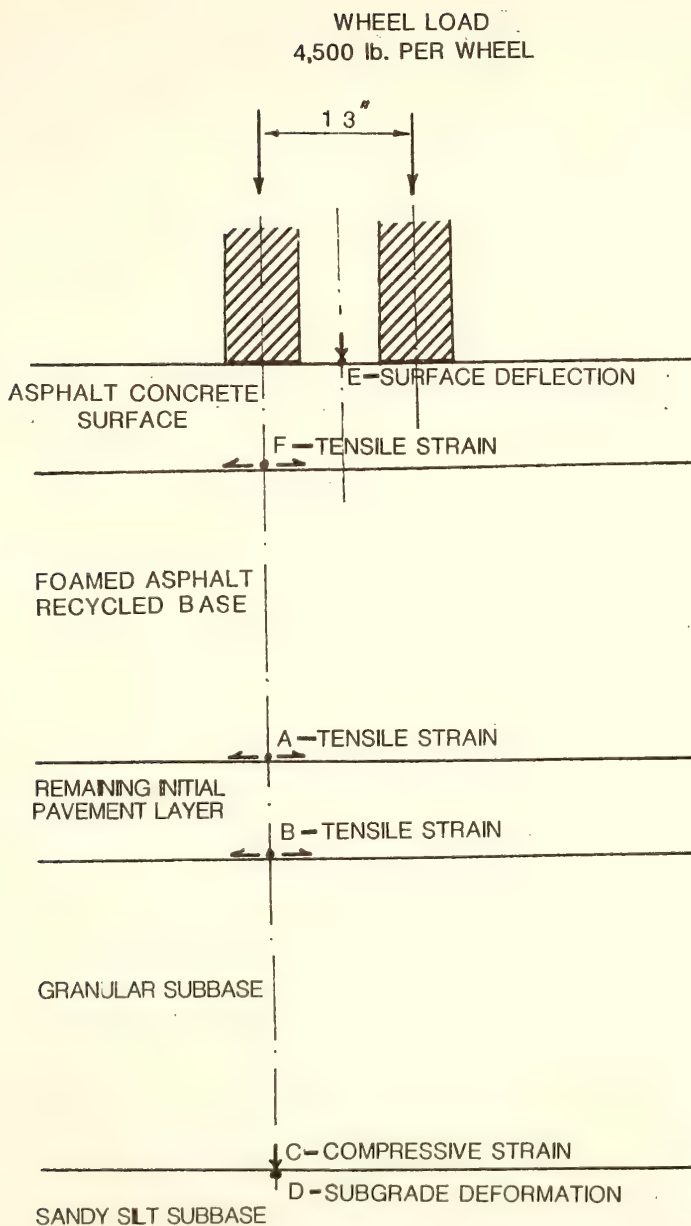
TYPICAL PAVEMENT CROSS SECTION
